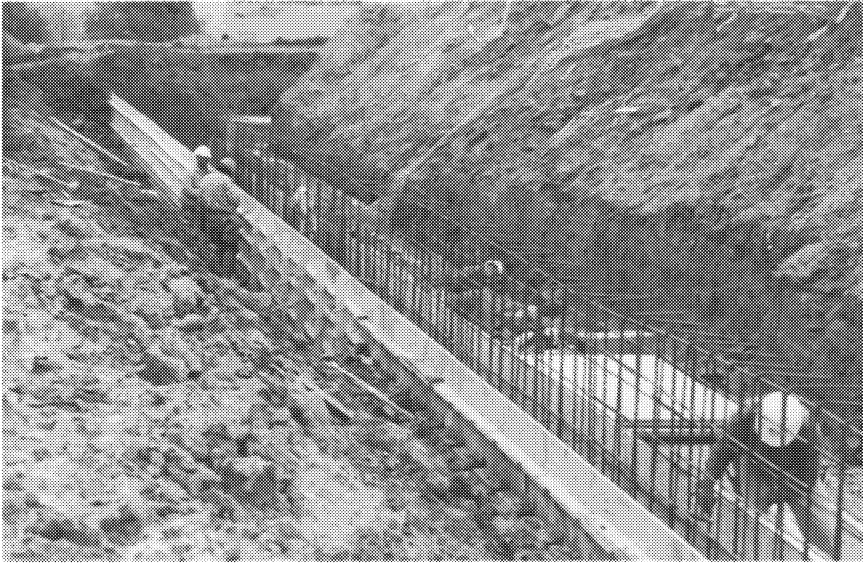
Reinforcement in progress for a foundation wall. Note bars bent over to extend into slab.
